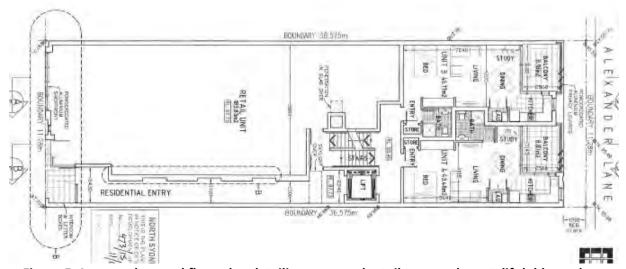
Approved ground floor plan detailing approved retail tenancy layout, lift lobby and residential plant rooms.
